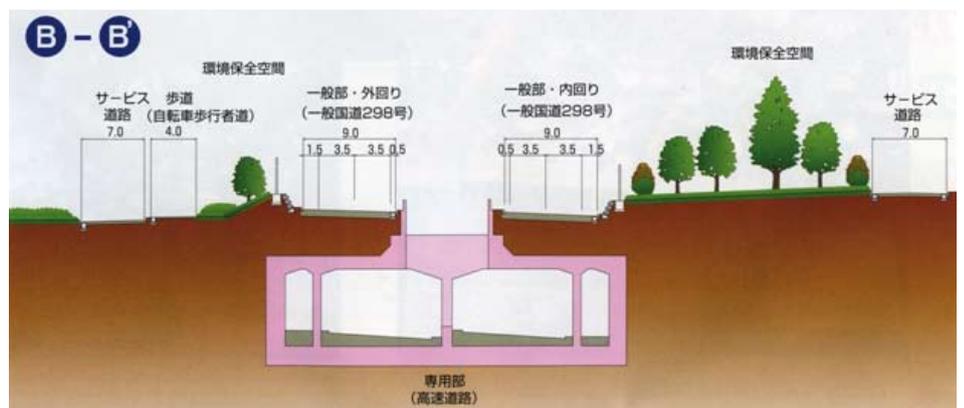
Cross Section cut and cover tunnel, Tokyo, Japan
